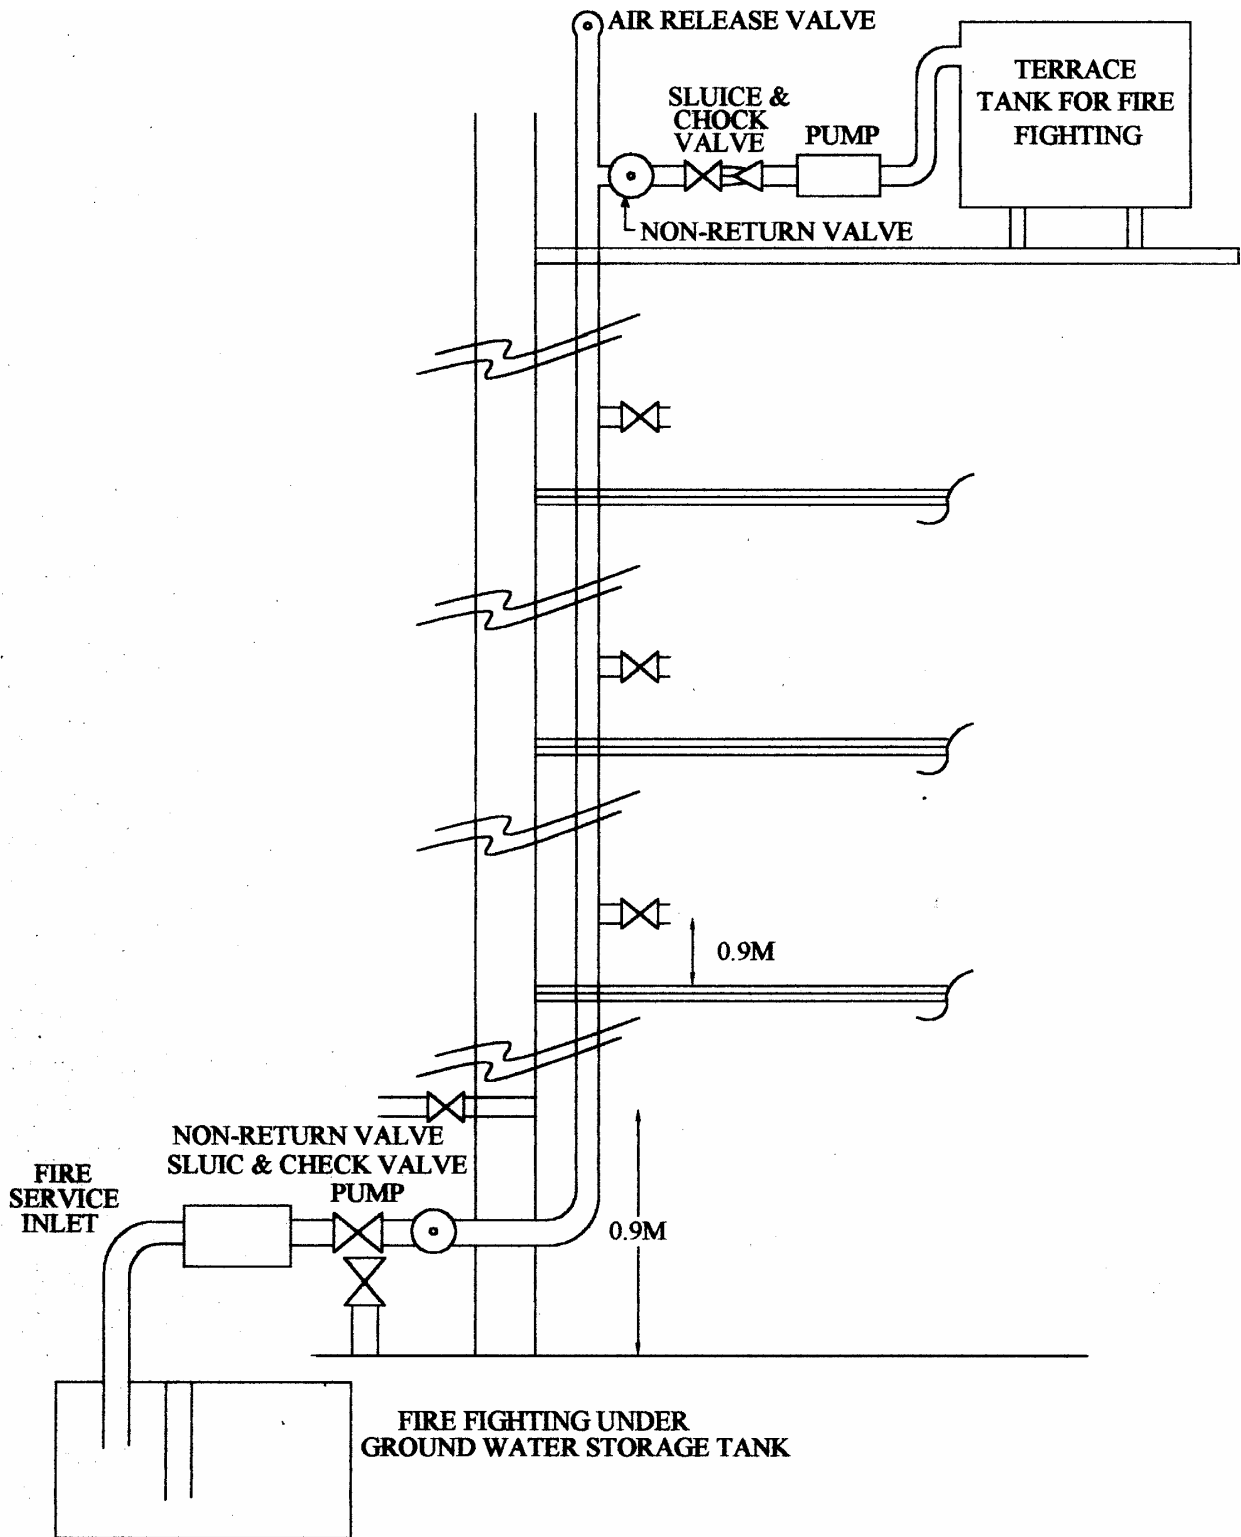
APARTMENT BUILDINGS EXCEEDING 13M
